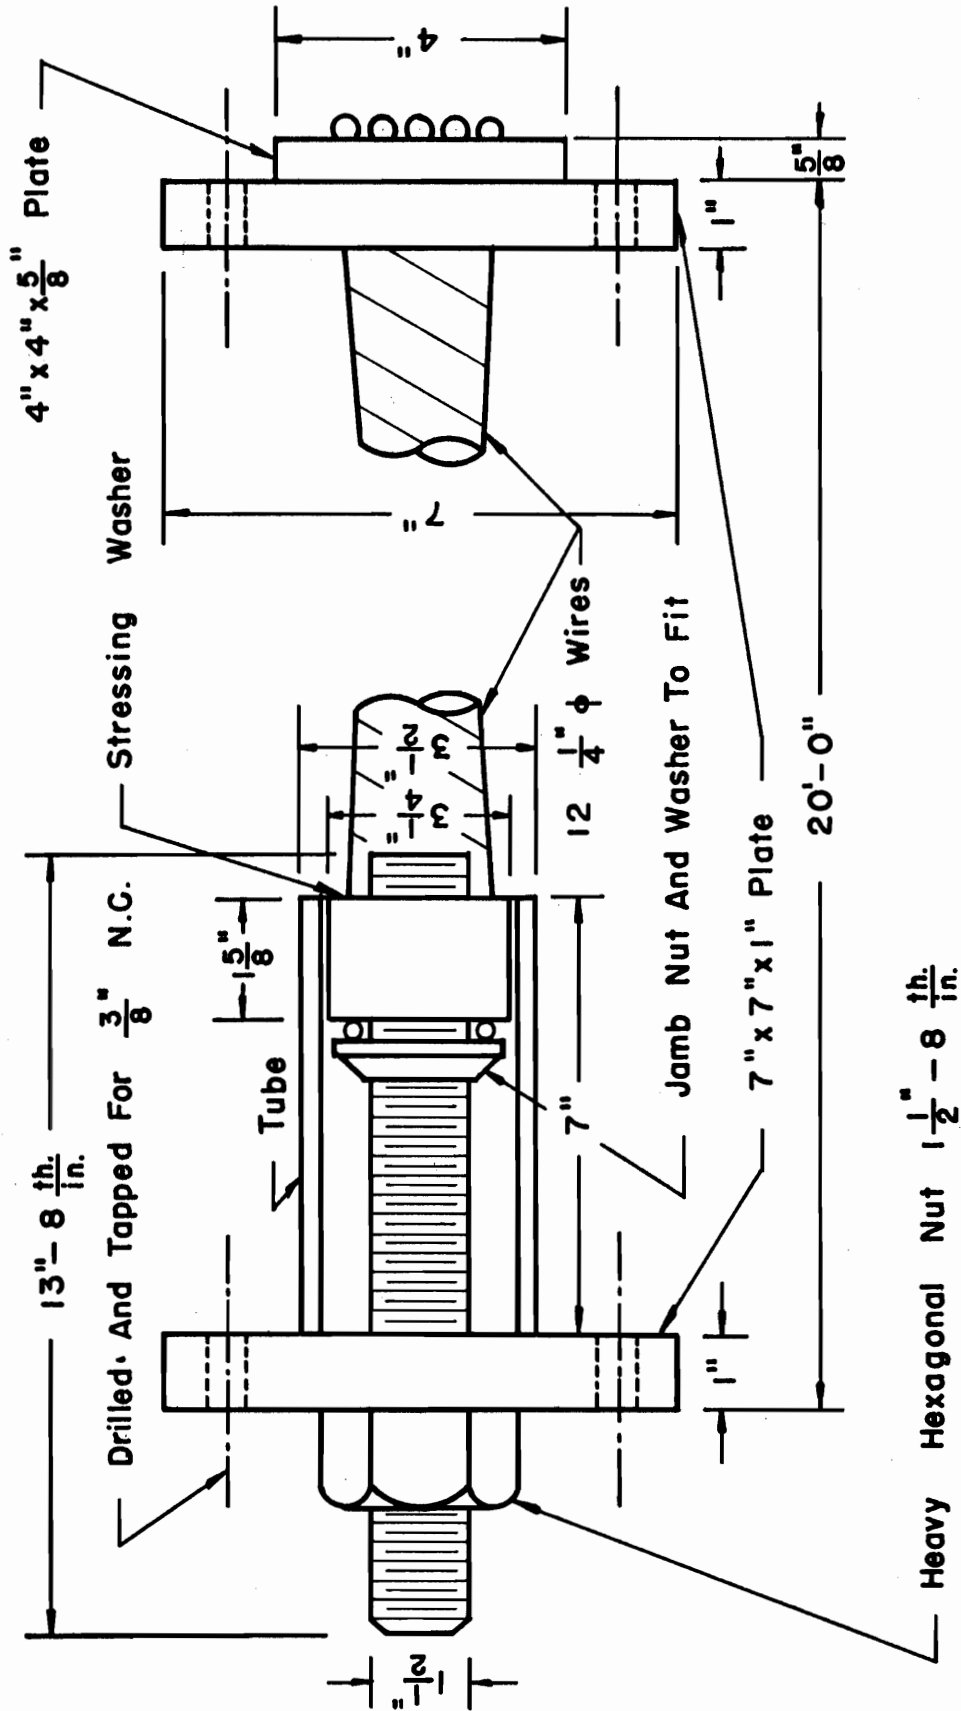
DETAILS OF 12 WIRE PRESTRESSING CABLE
